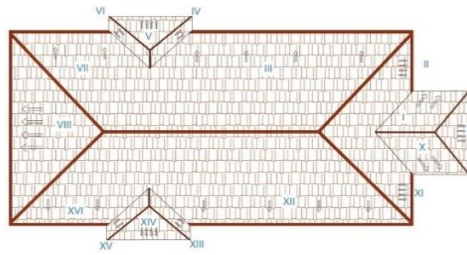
The Segmentation of Roof Section of Abu Bakar Dormitory Building
